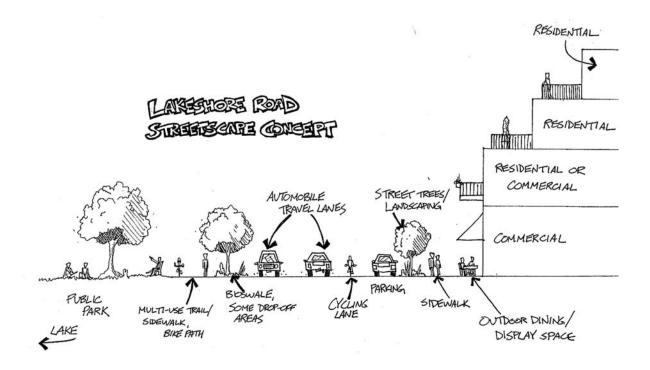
Conceptual Drawing of Lakeshore Road Streetscape.
